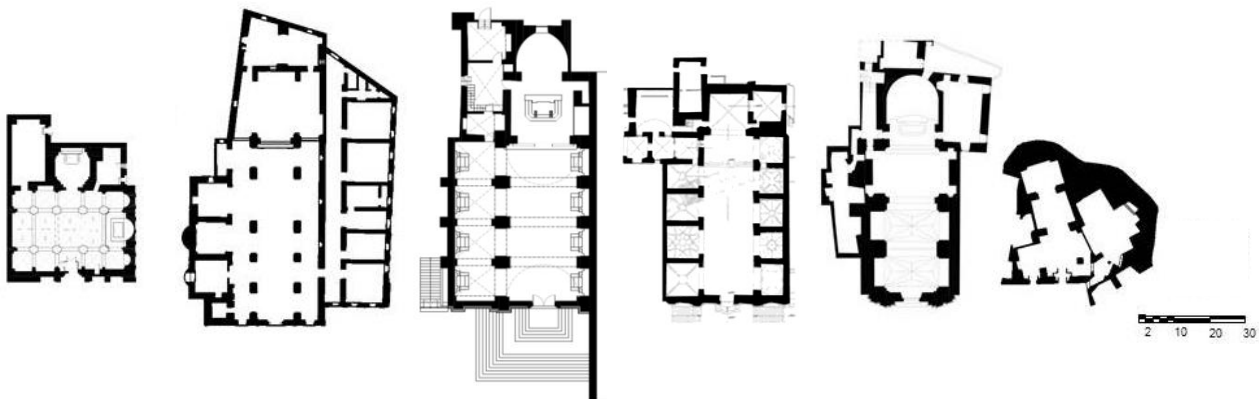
Churches floor plan (from left to right): San Giovanni Battista, San Pietro Caveoso, San Rocco, San Francesco d'Assisi, Sant'Agostino and Santa Maria de Armenis. Reference: Superintendence for the Architectural and Landscape Assets in Italy, 2016; La Scaletta 1960; and Chietera, 2017.
